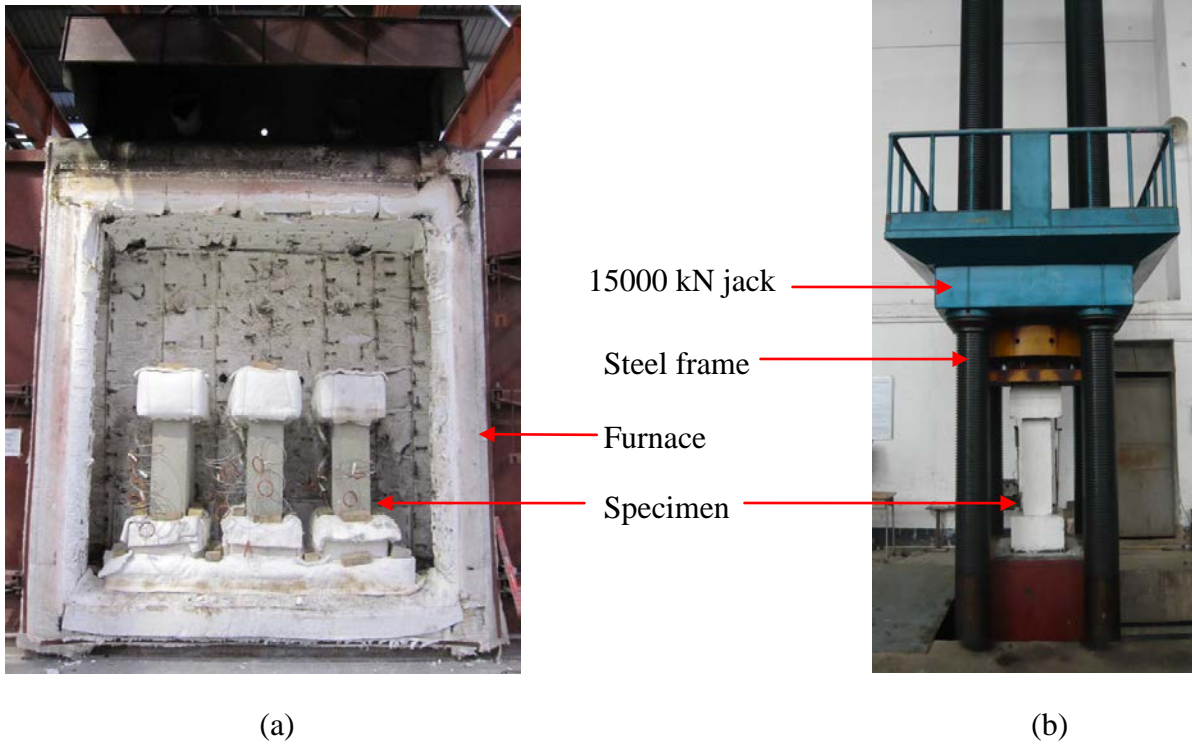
Test setup: (a) Photograph of the furnace; (b) Photograph of the compression machine
